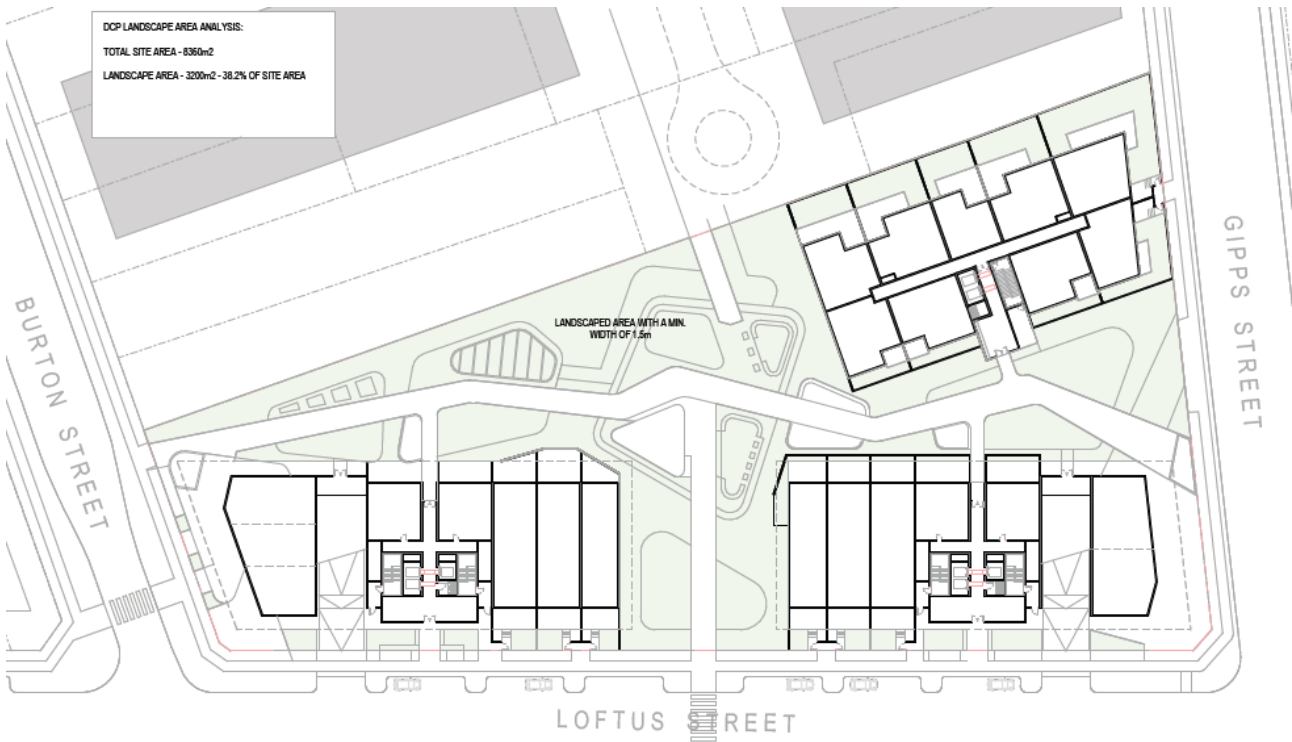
Proposed landscaped area (Proposal Urban Design Report)
